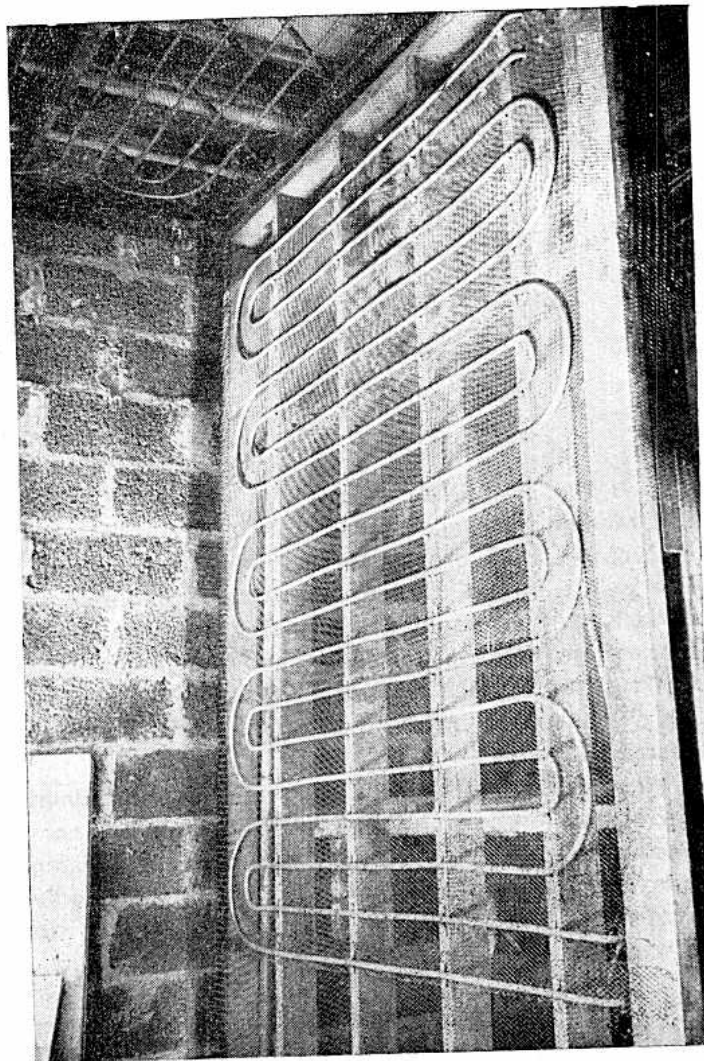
One wall coil installed in front of metal lath. Ceiling coil behind lath.
